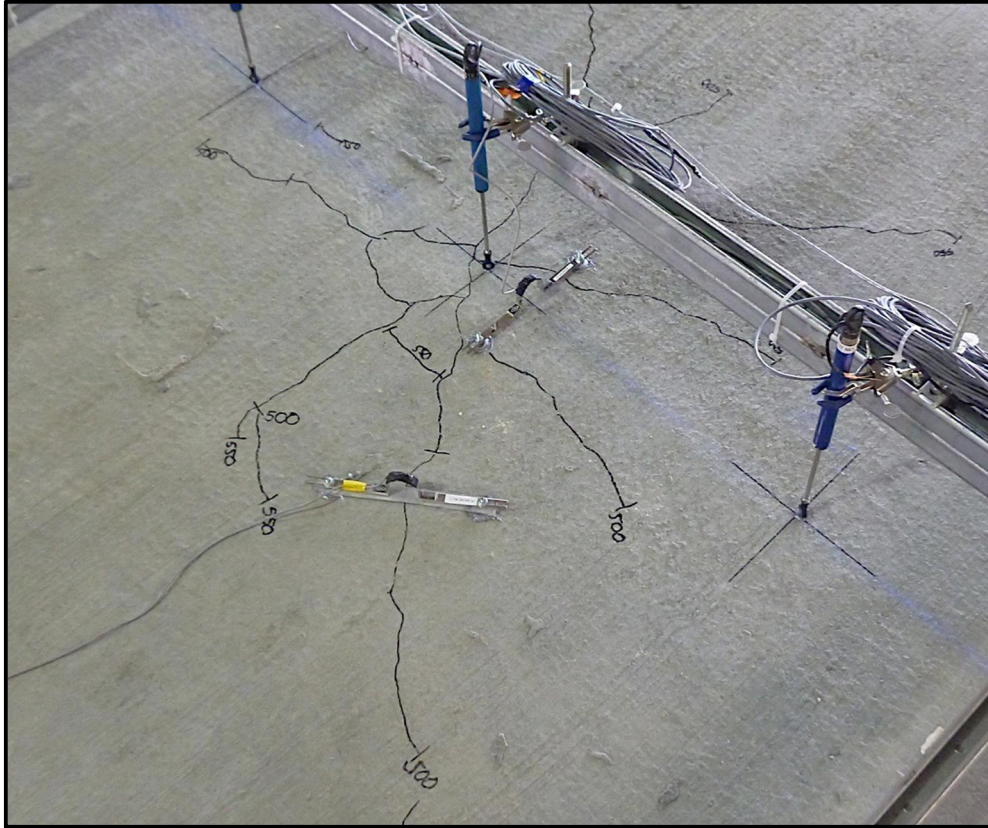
Typical Pi-Gauge Setup With Diagonal Crack Gauge Installed
